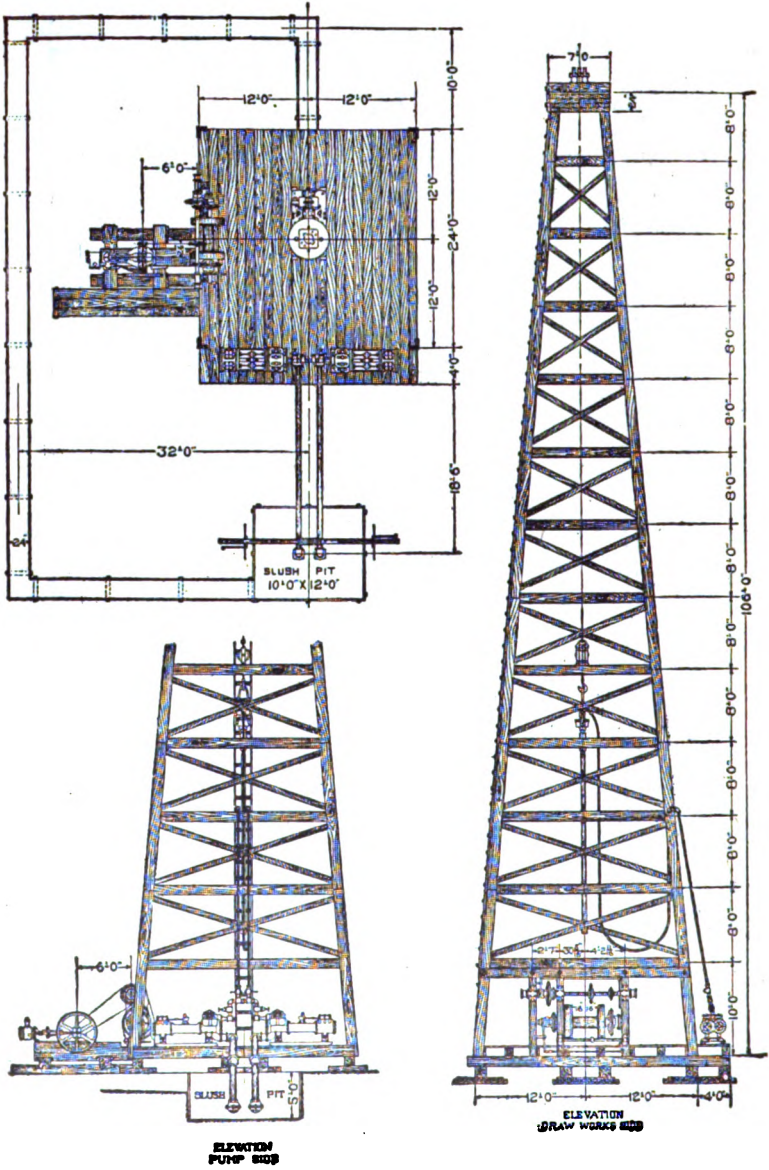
Side elevation and ground plan of 106-foot Texas rotary drilling rig, showing machinery installed ready for drilling.
